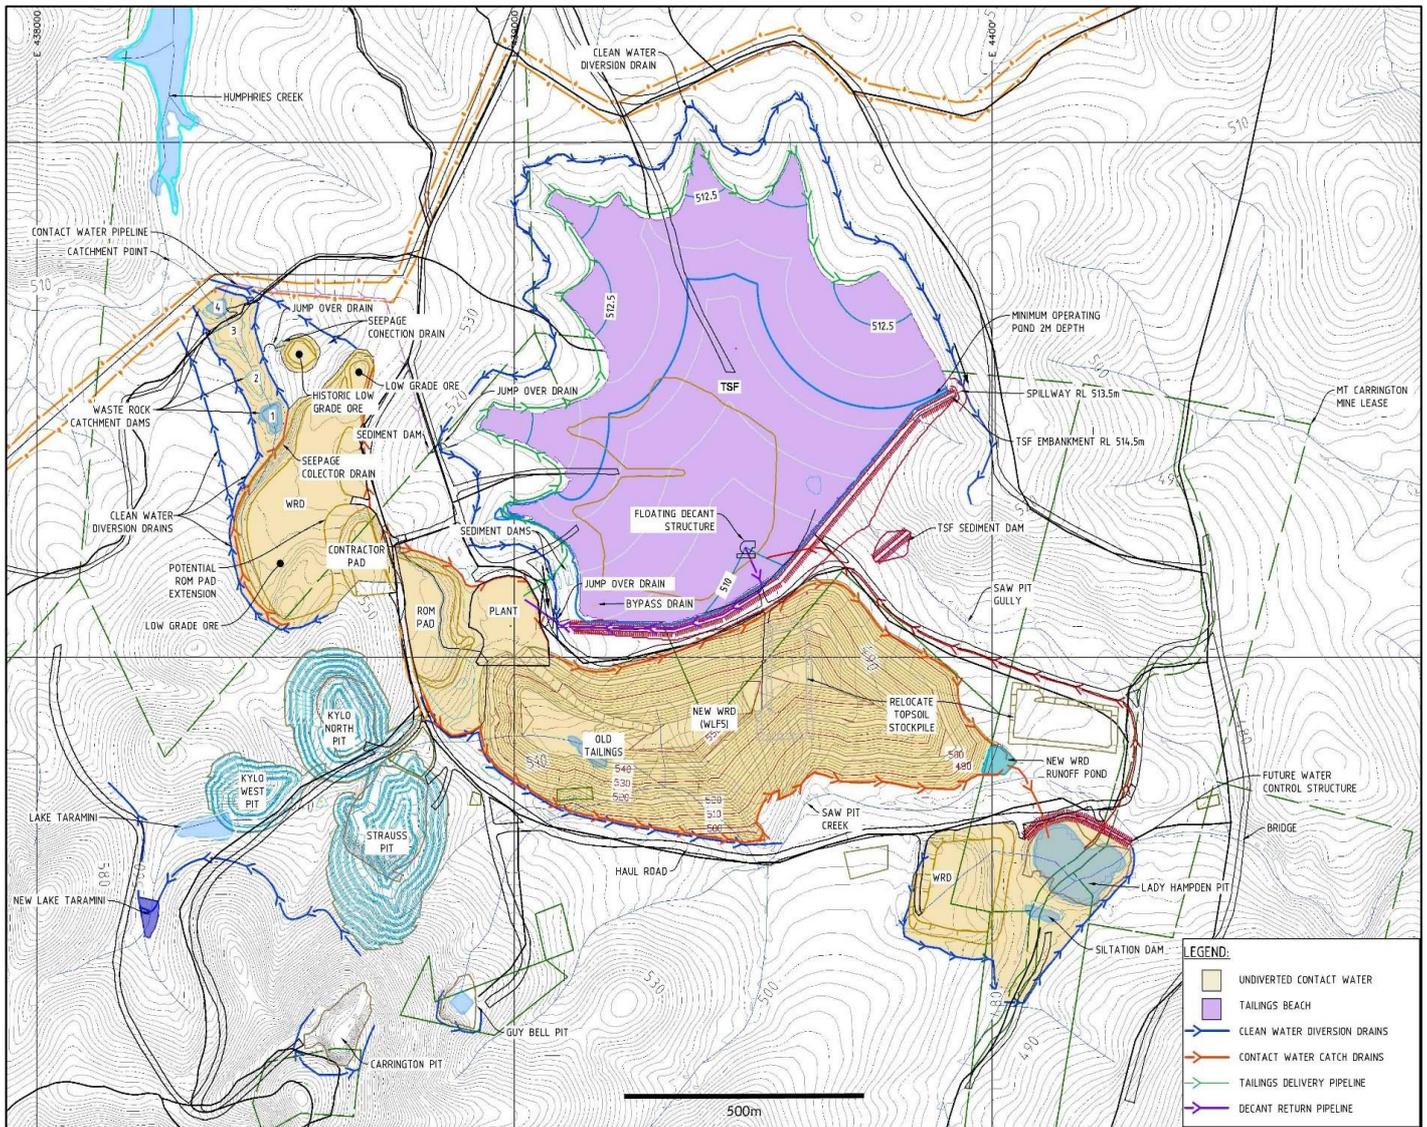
Mt Carrington Site Layout, TSF and drainage design (from the 2017 PFS)
